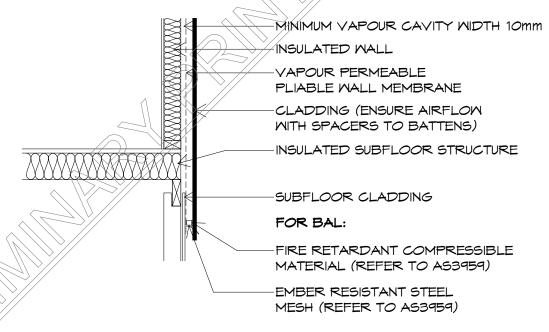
SUSPENDED TIMBER FLOOR WITH VERTICAL BATTENS
